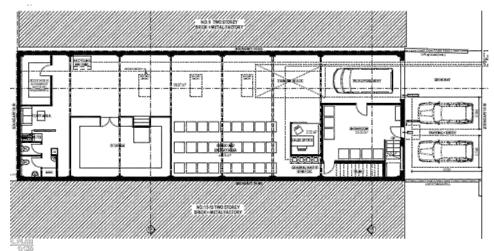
Approved Ground Floor Plan under DA-2018/1032
